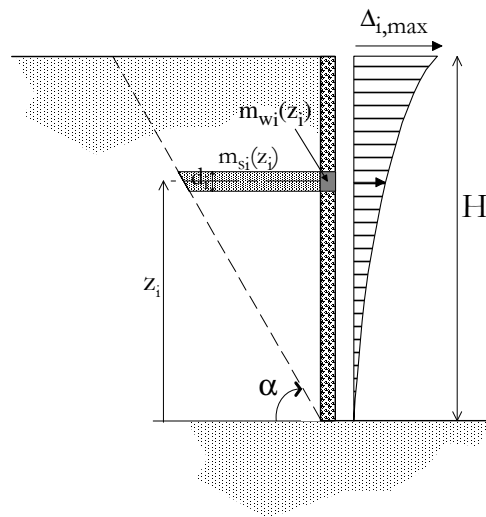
Discretized system of a diaphragm wall (simulated as a cantilever beam)
